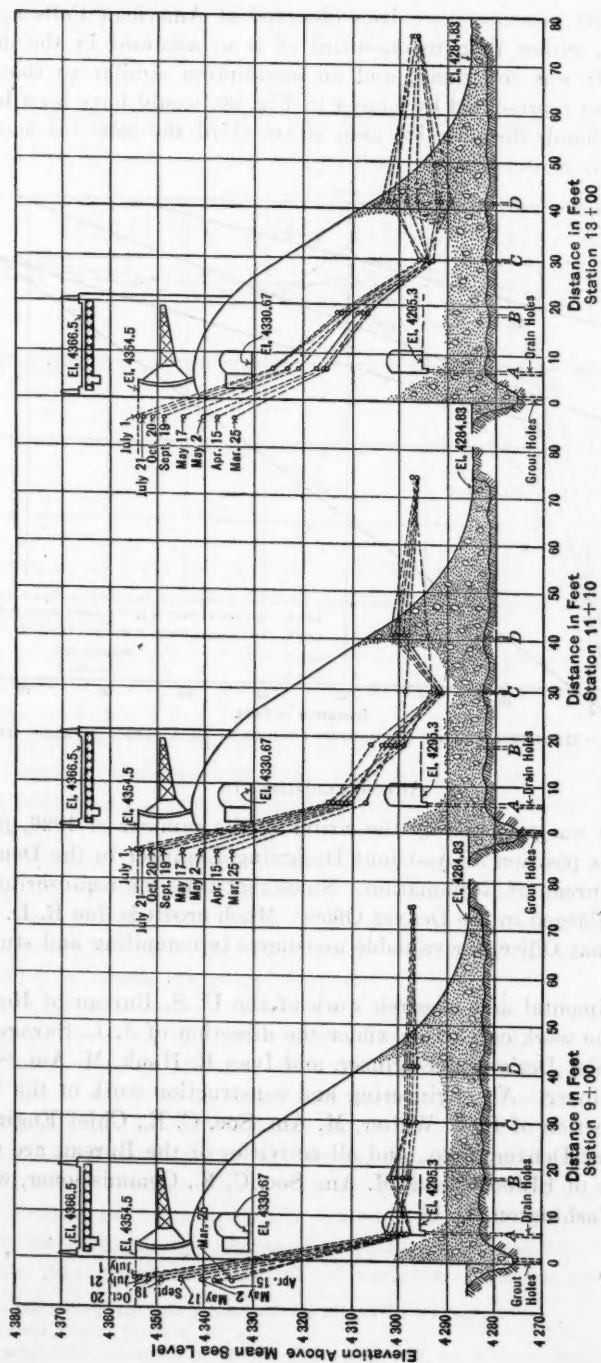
UPLIFT PRESSURES OBSERVED AT AMERICAN FALLS DAM.
